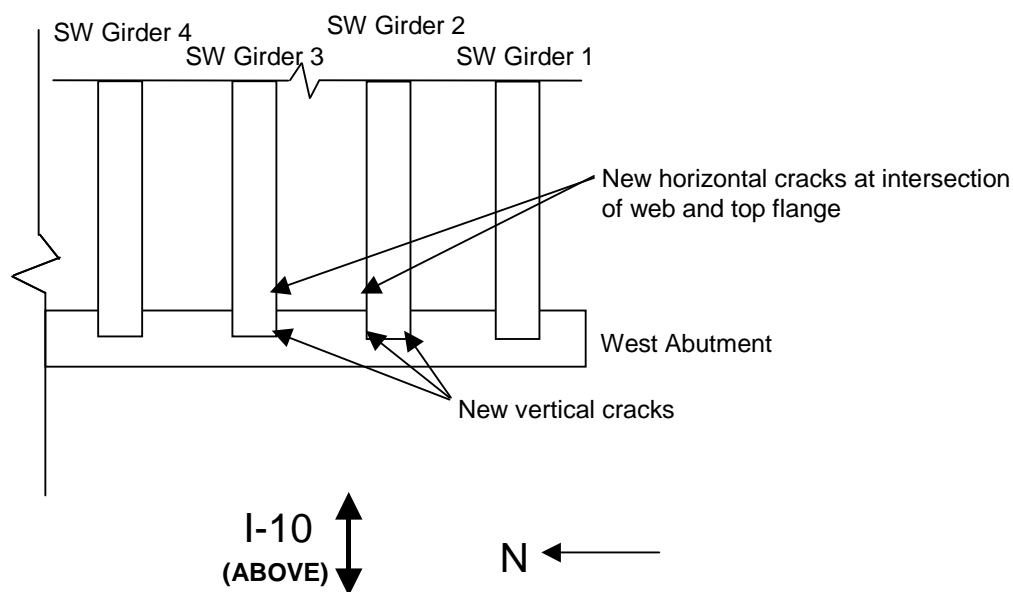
Location of new cracks on I-10 structure (plan view) (12/10/01)
